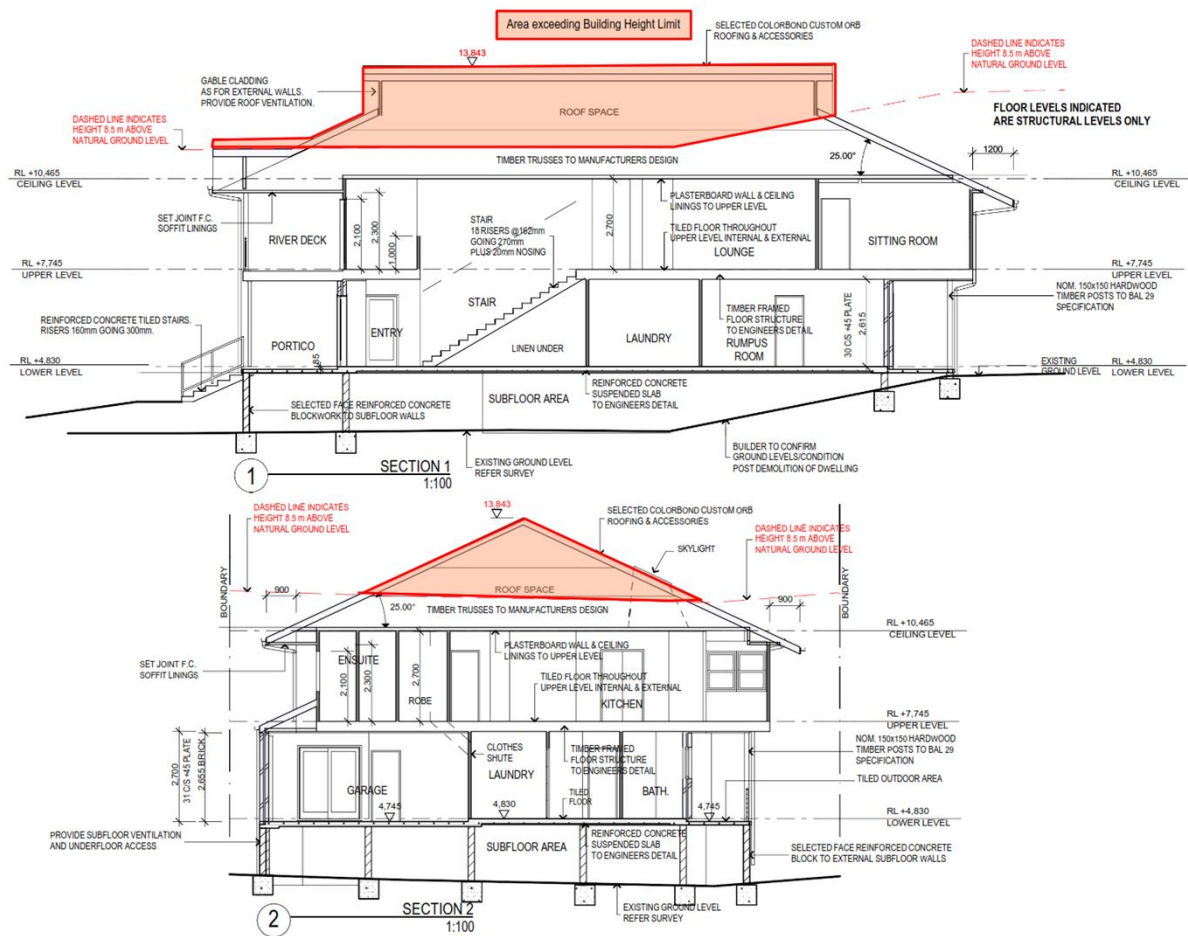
Portion of proposed dwelling exceeding 8.5m building height limit.
